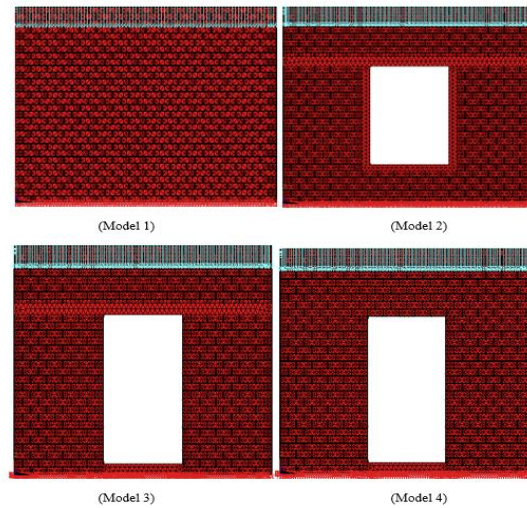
FEM model of masonry walls. (Bose and Paul, 2014) [29]
